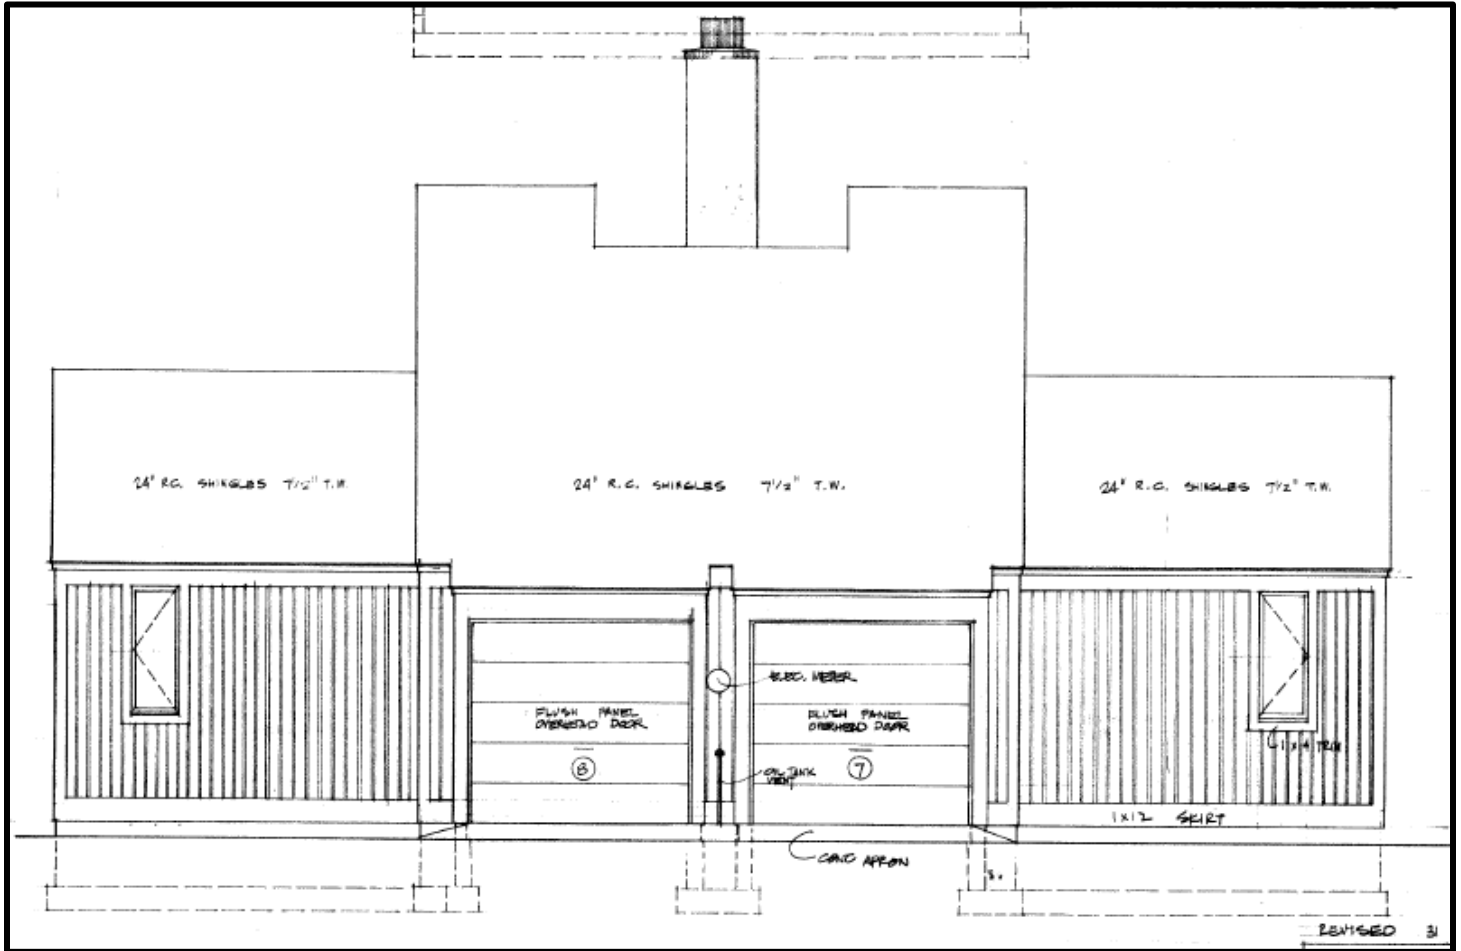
West Elevation, Guest House (Architect's drawings, 1962).
